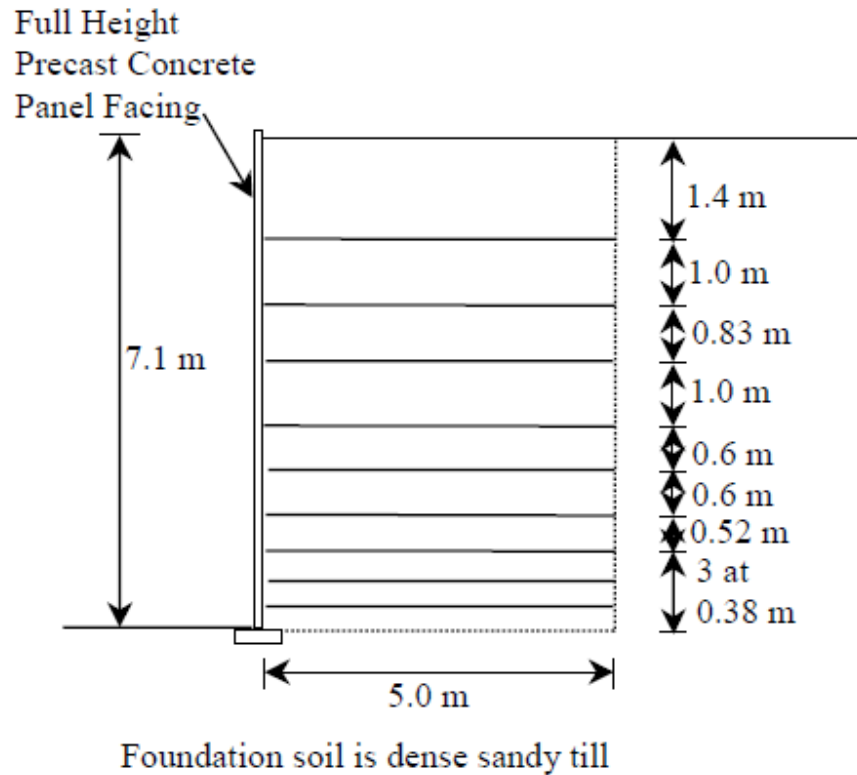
Cross-section for geogrid reinforced MSE wall, London, Ontario (Allen et al. 2001).
